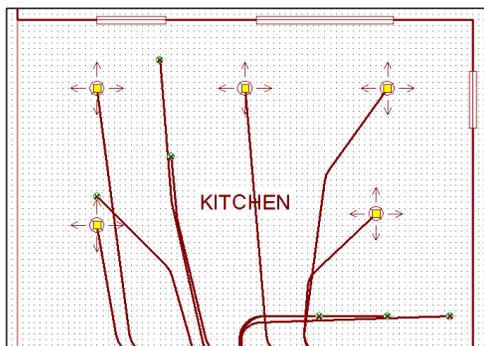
Example of Ceiling Boots spaced out to reach all areas of the room.
